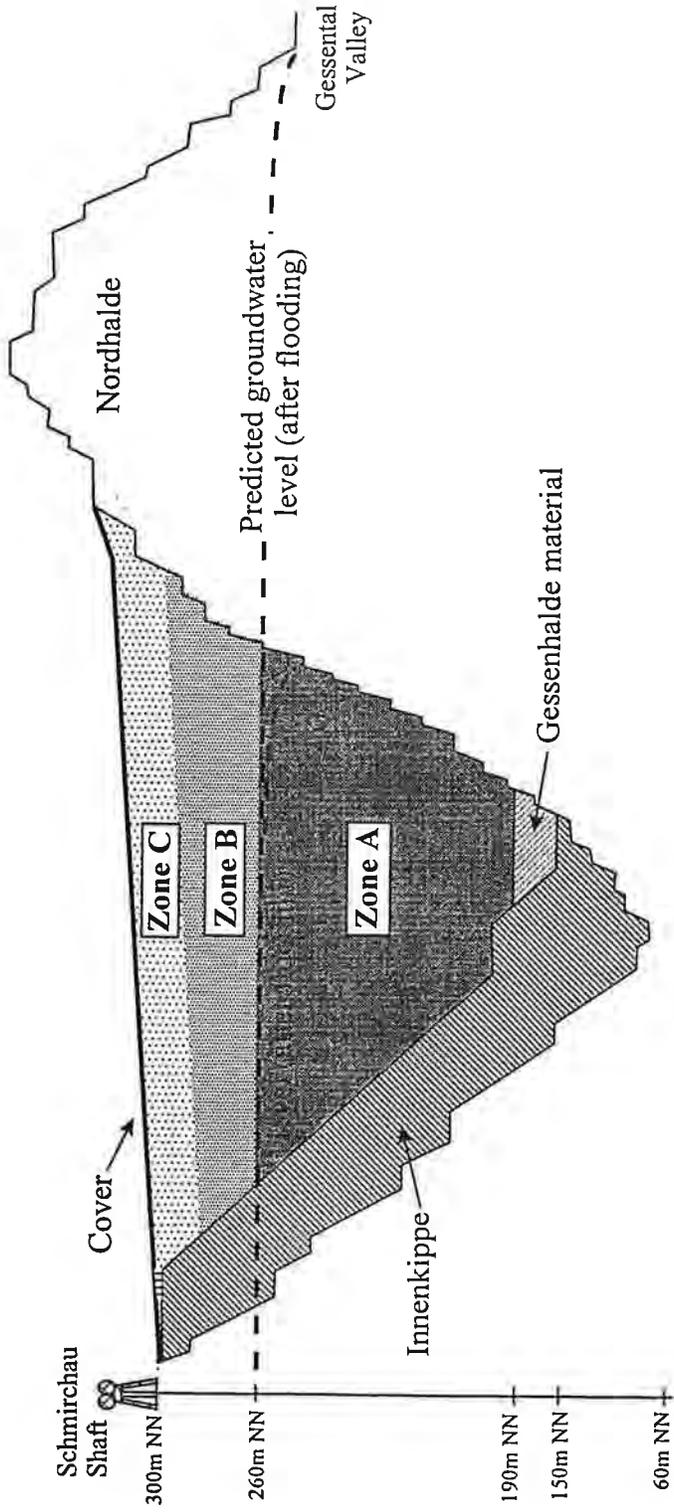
Section Through the Lichtenberg Pit Showing Waste Rock Relocation Zone A, B and C
